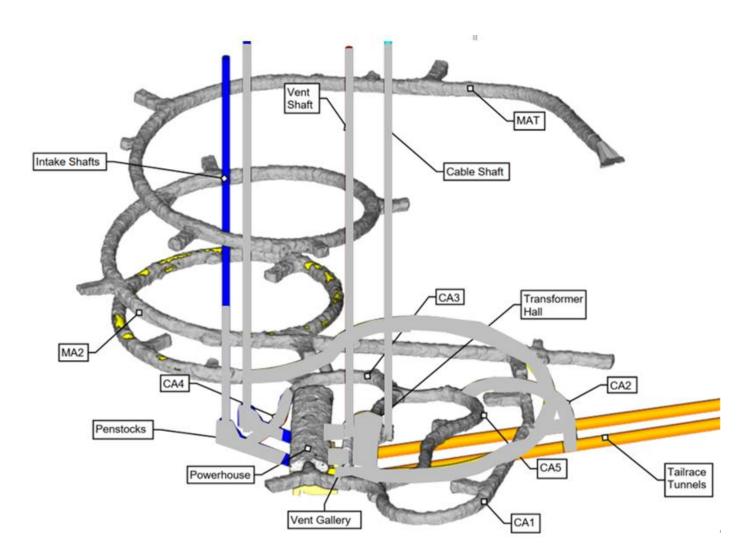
Status of underground excavation works as at 4th December 2023 (grey highlight means fully constructed)
